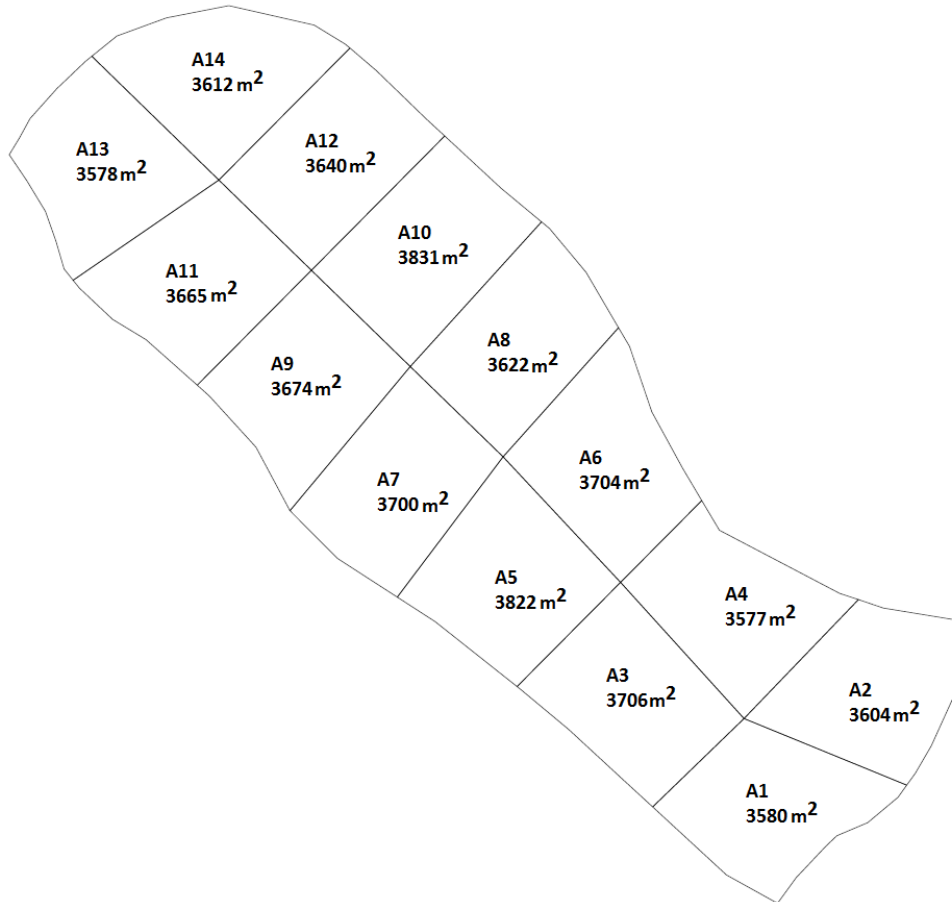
Sections of the deposit, provided by Bane NOR
